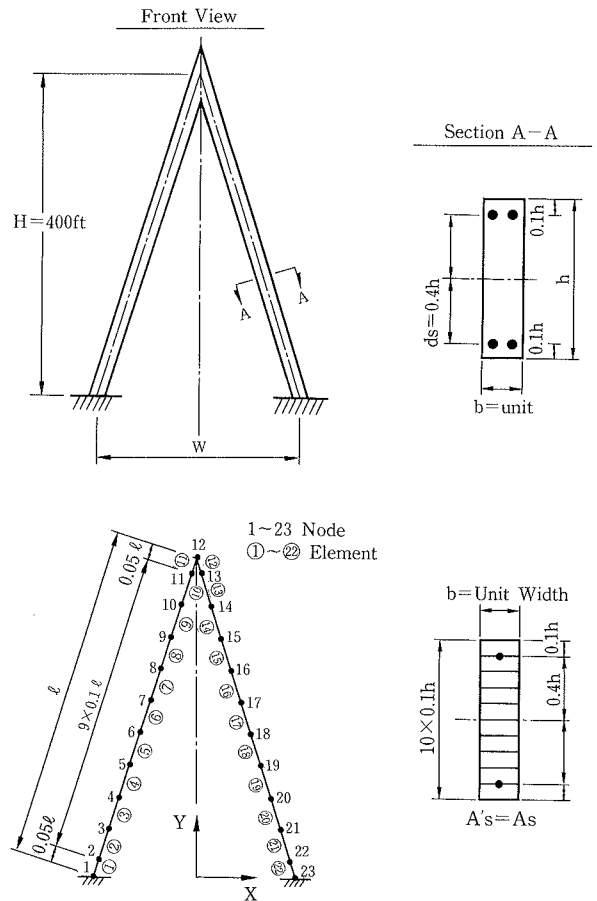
Modelling of an A-Shaped Tower into Finite Elements and of Cross Section into Layers
